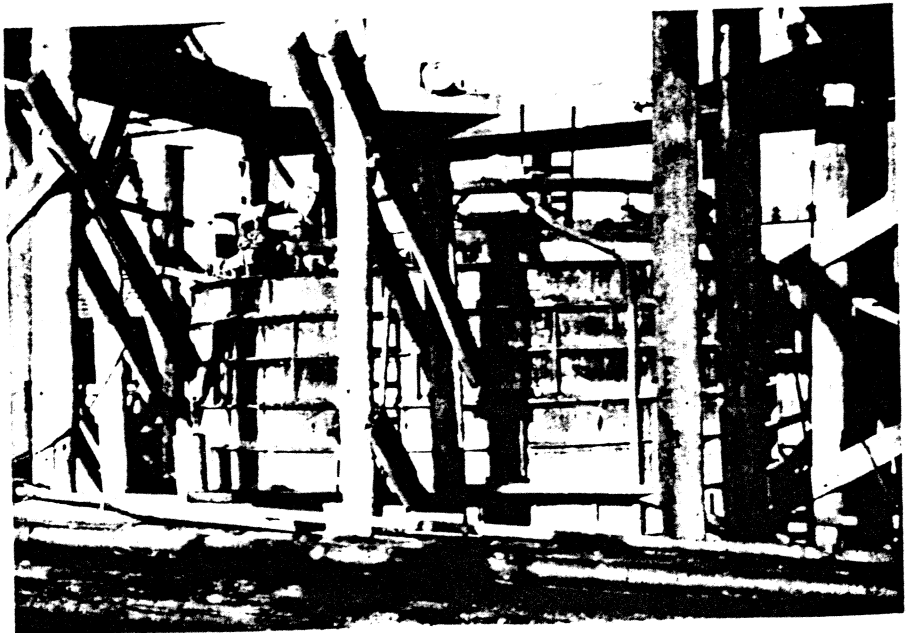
Assembling the cutting edge and bell steel on the gravel island. Jet pipes to be embedded in the 5-ft. concrete wall appear along the back side.
